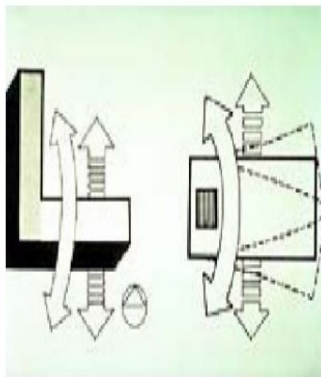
Shape of Building Plan (L Configuration) and By a Very Stiff Off-Center Core Area in a Rectangular (Regular) Plan Building.
